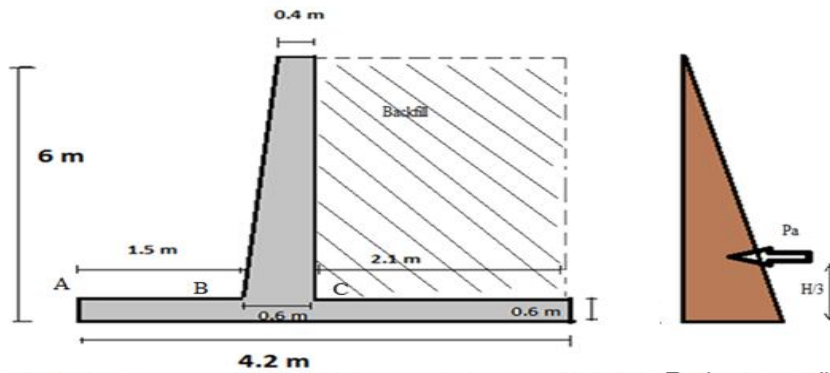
Cantilever retaining wall without pressure relief shelf Earth pressure diagram
